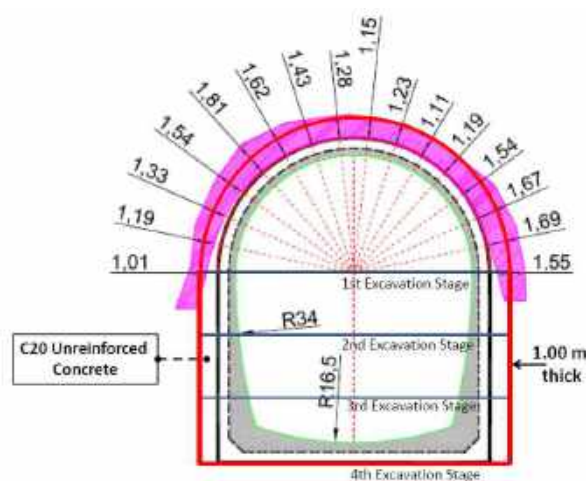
Geometry and rock support of the Diversion Tunnel considered in the new calculations (also included is the proposed stabilization support system).
